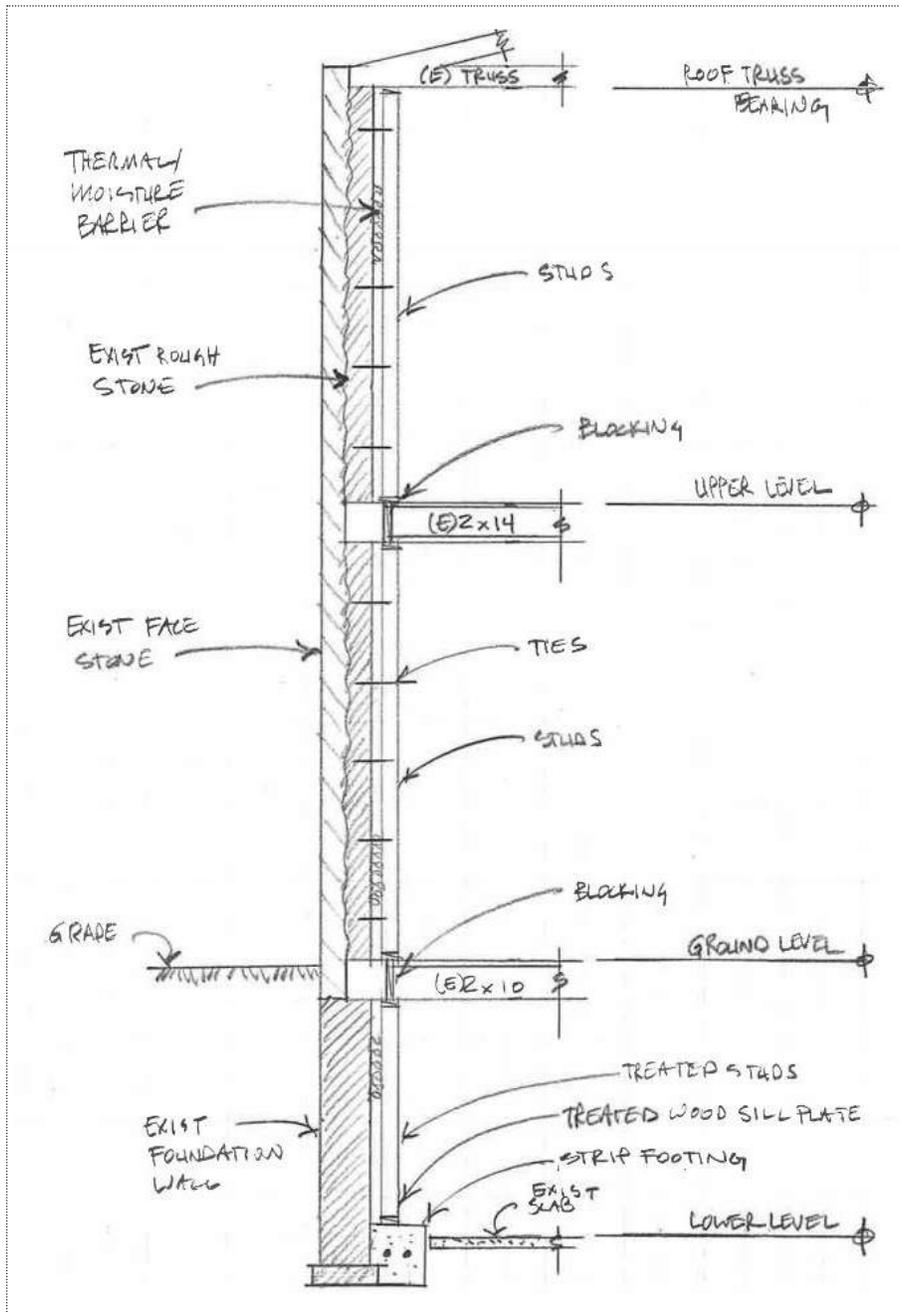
Wall section illustrating potential strategy for structural reinforcing of masonry walls.
